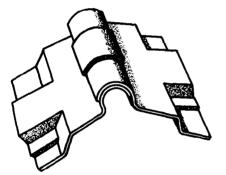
TYPICAL EXPANSION JOINT FOR SERRATED RIDGE
